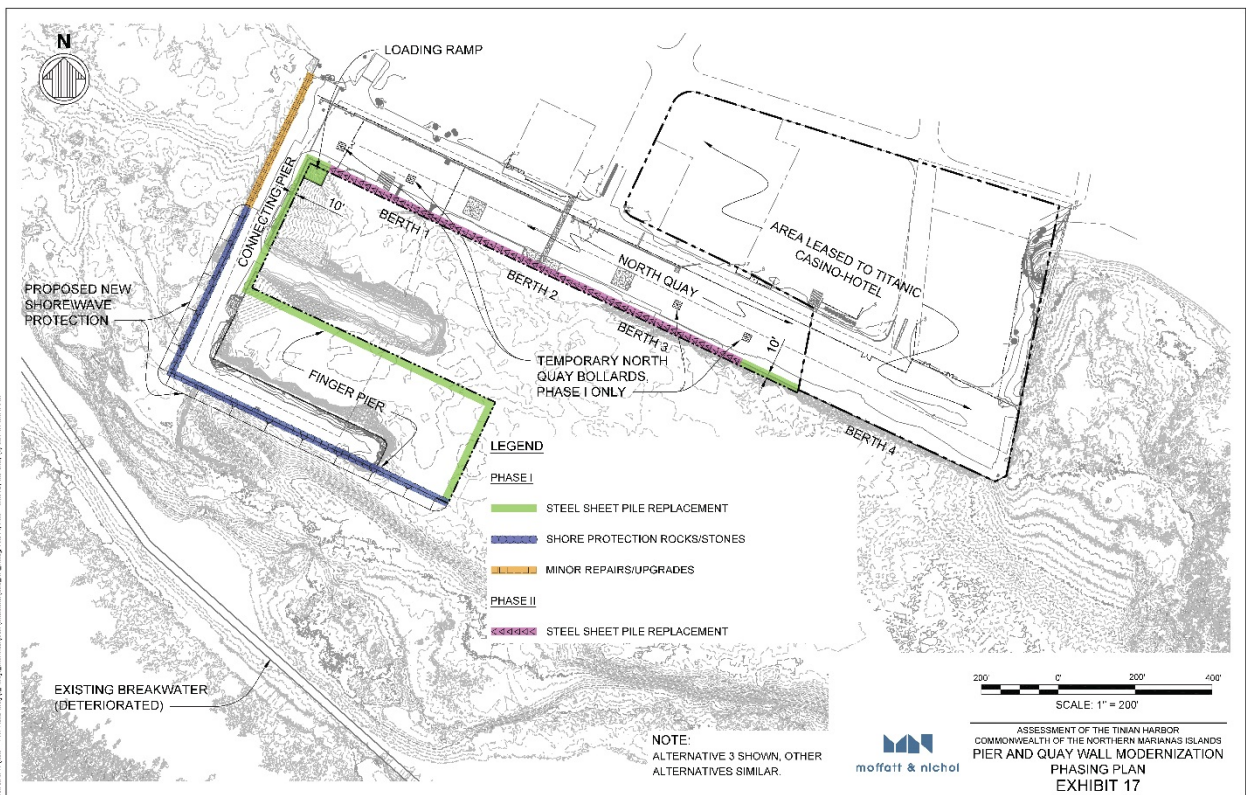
Pier and Quay Wall Modernization Plan Alternative 3
